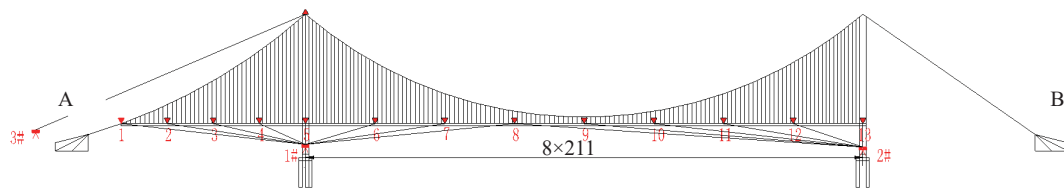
Longitudinal arrangement of deflection measurement points on the bridge (unit: m)
